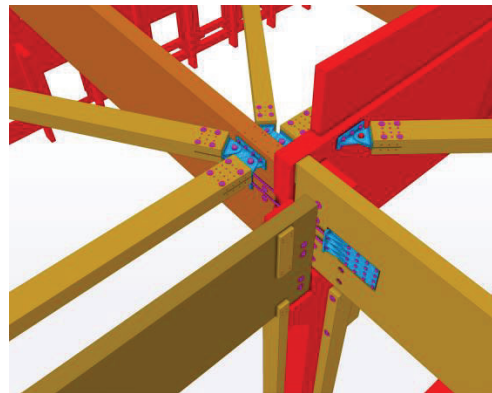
3D interface from timber to concrete with 1,000 kN load transfer
